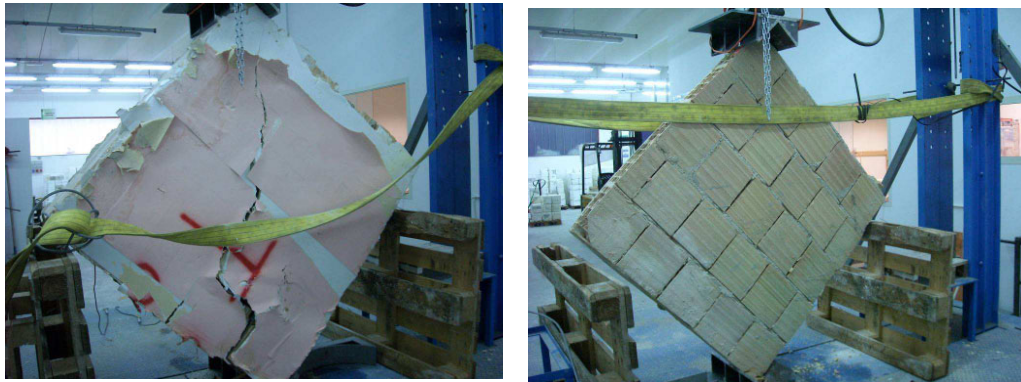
Diagonal compression tests on specimens of infill walls extracted from the collapsed buildings
